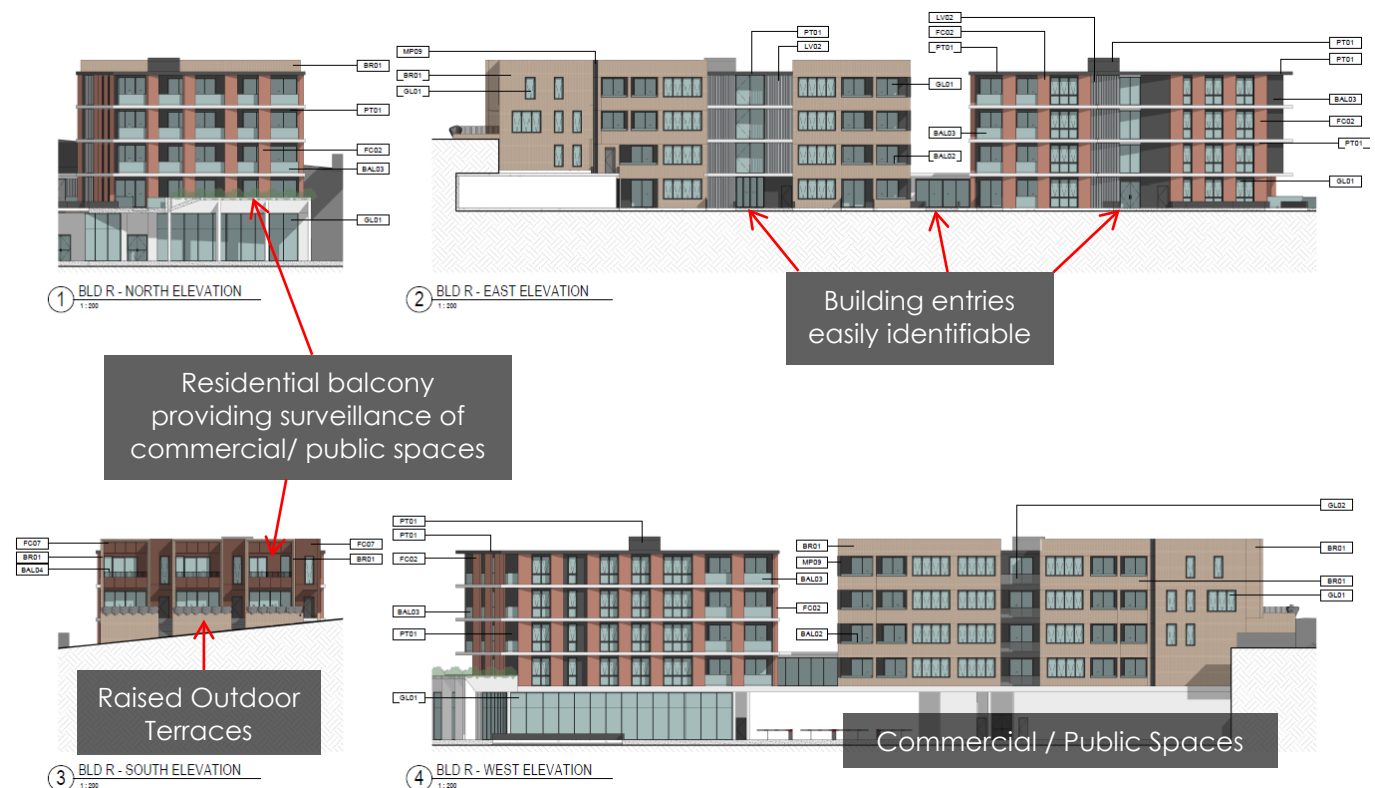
Extracts from Building R Elevations (Source: Group GSA, 2025)
